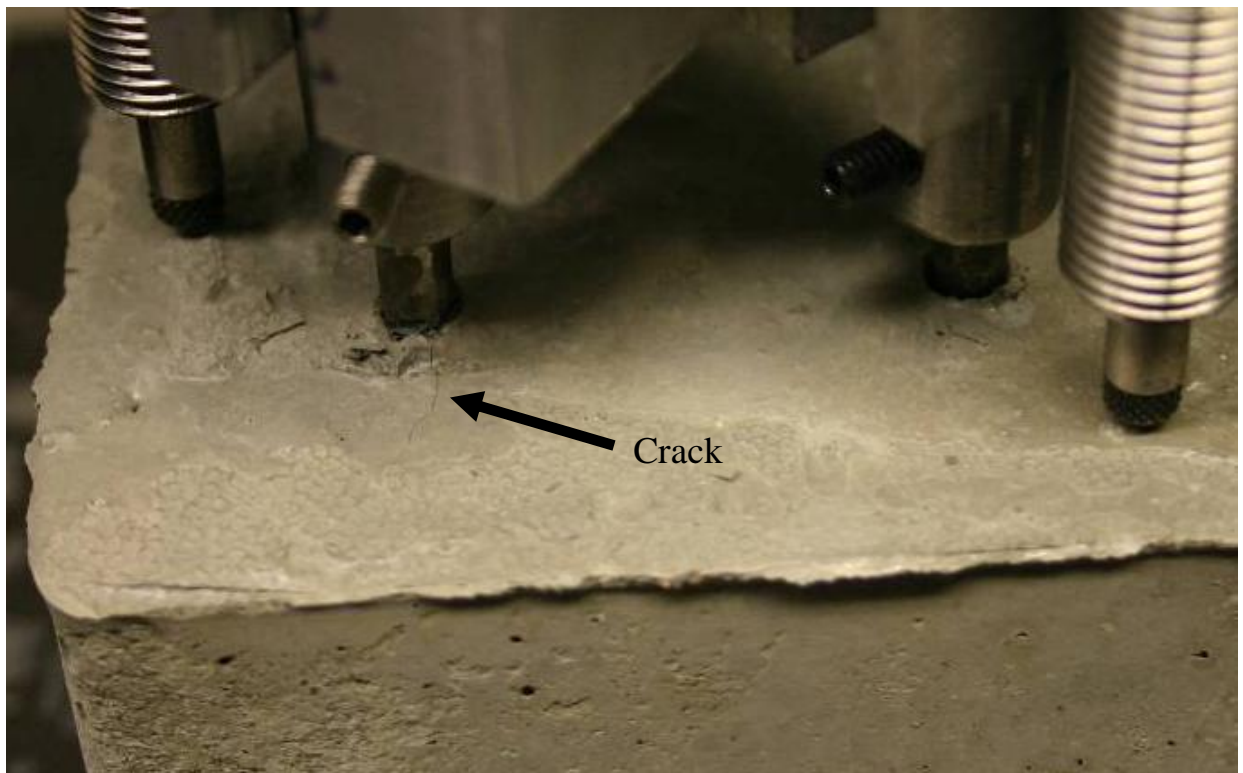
Cracking of specimen with three 1/8-inch diameter rods located on the wire
